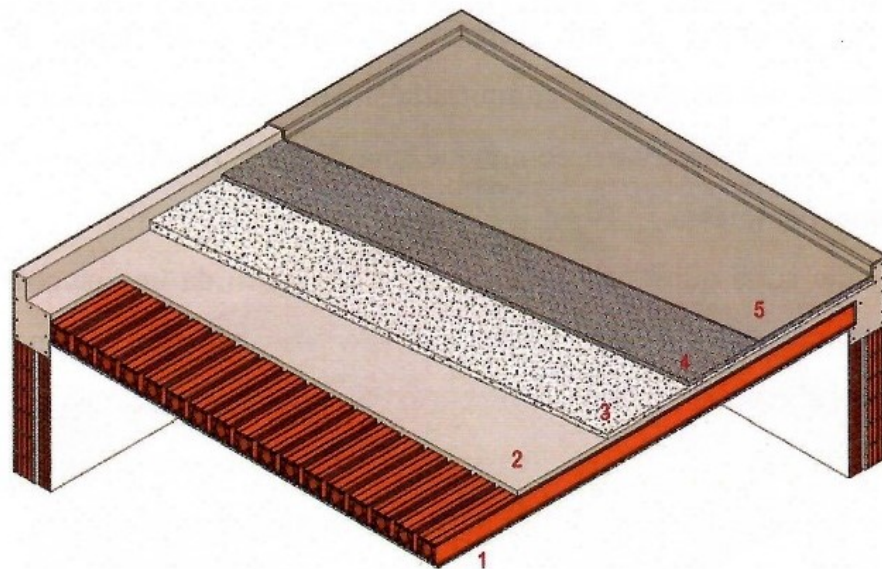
SAP floor: 1) Reinforced brick beams, 2) Mortar layer, 3) Slope screed, 4) Insulation layer, 5) Waterproof sheathing
